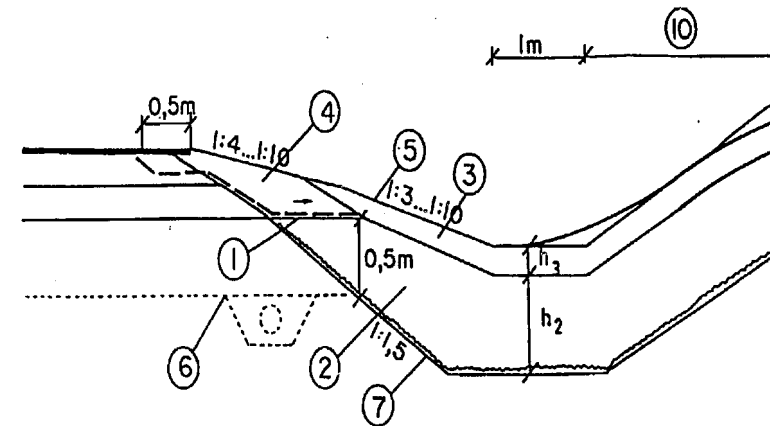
Road embankment on soil stratum. Guideline for slope protection.*)
